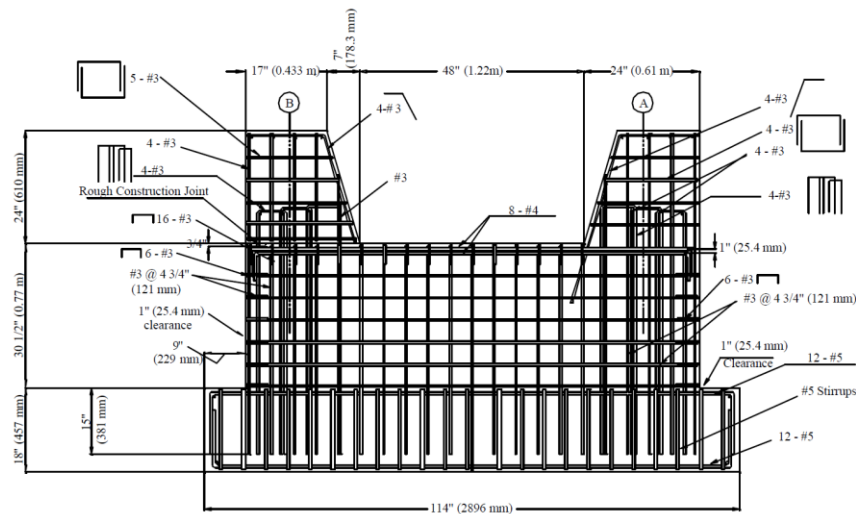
Elevation view of design details for Specimen 4 (from Borzozgadeh et al., 2006)
